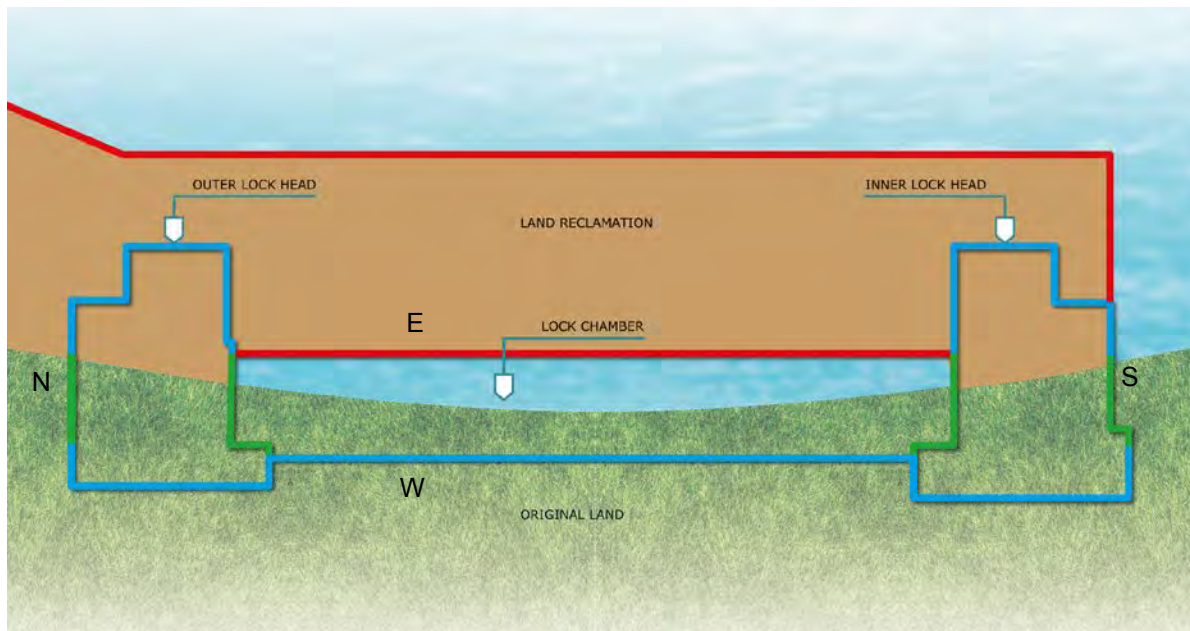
On the reclaimed land, deep diaphragm walls (blue) are built to form the lock heads and western lock chamber Wall.
